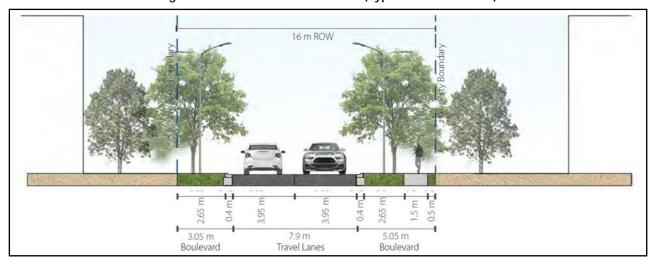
16.0m ROW Local Road (Typical Cross-Section)
